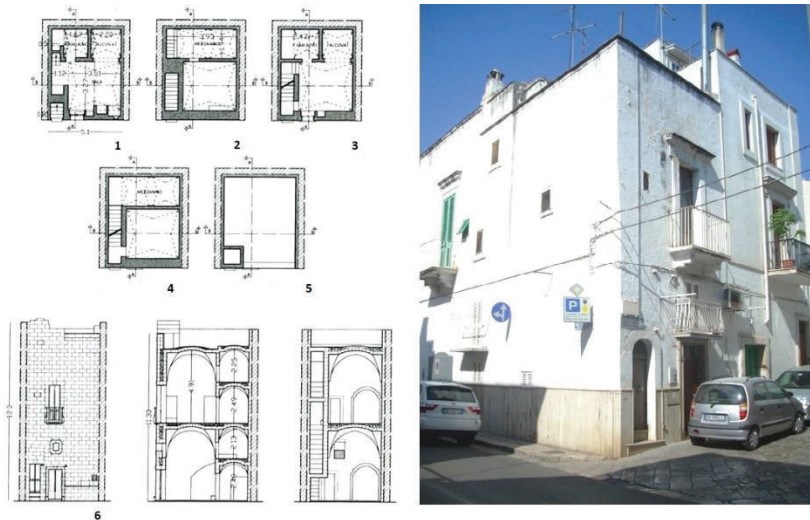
The houses in the Fasanese style: a) 1 ground floor plan, 2 raised plan, 3 first floor plan, 4 raised first floor plan, 5 roof plan, 6 sections; b) perspective views.
